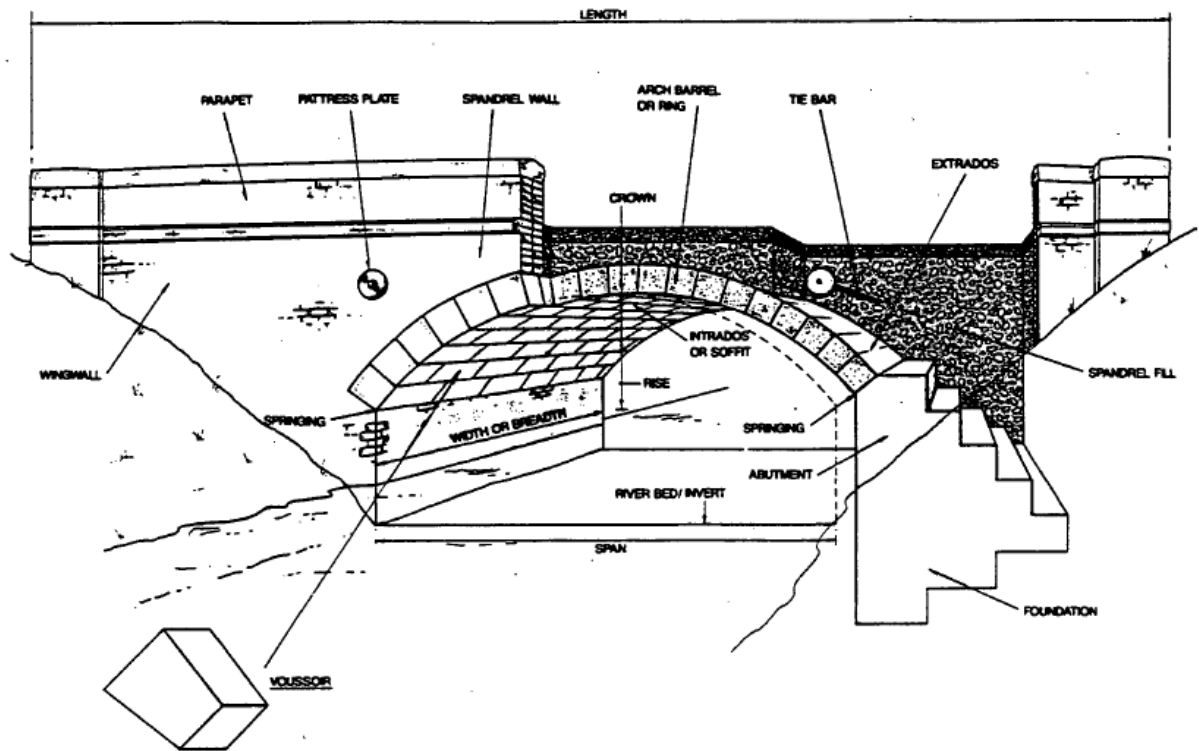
Identification of the different parts constituting a masonry arch bridge [Galasco et al. 2004]
